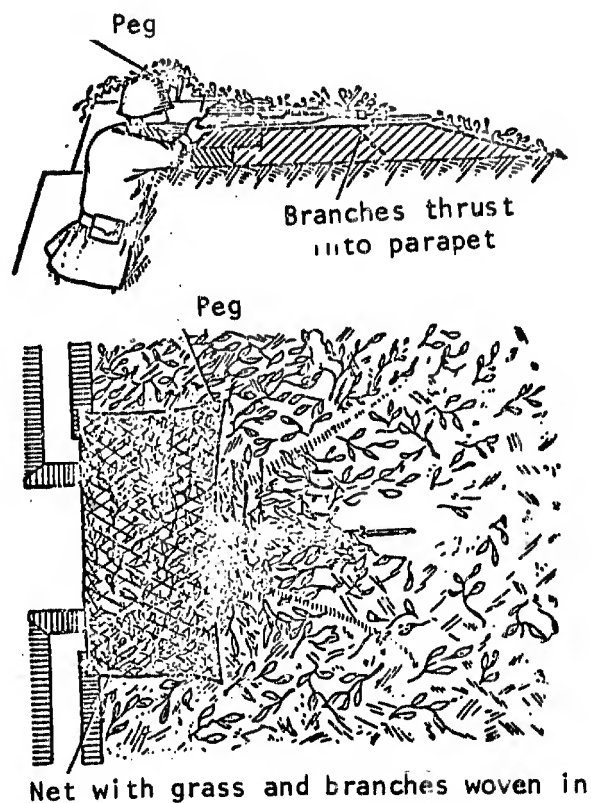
Camouflage of Firing Pit Adjoining a Trench.
